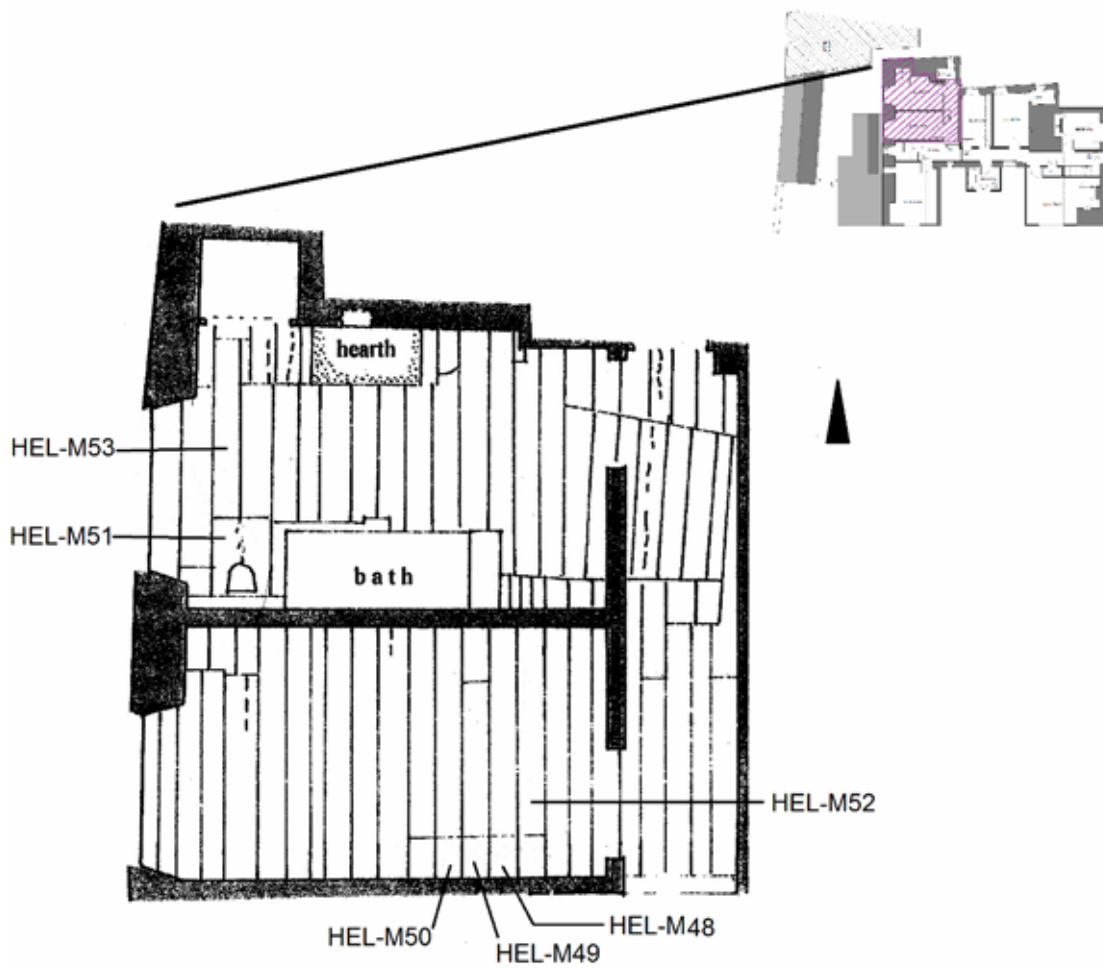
Plan of old flooring on the first floor, showing the location of samples HEL-M48–53 (Ryder 2012)
